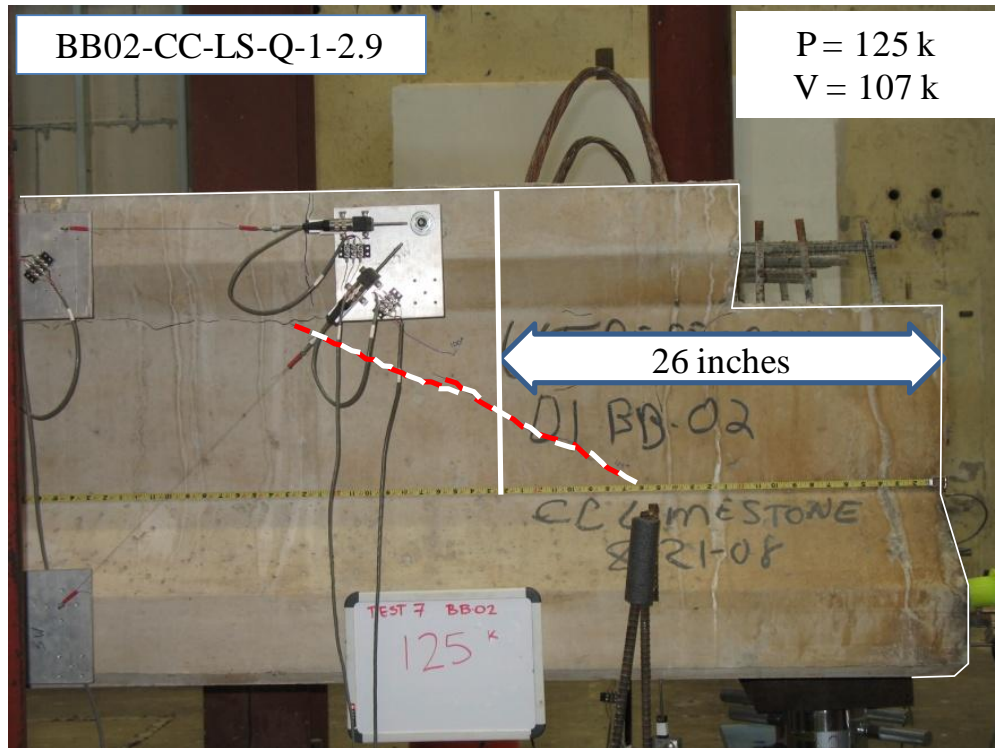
Diagonal crack centered 26 in. from the end of the beam. Test on the square end of BB-02 is shown (long side web).
